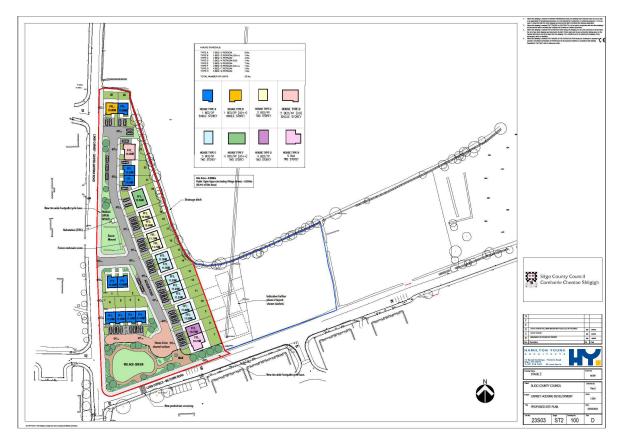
Site Plan for the new housing development at Carney, Co. Sligo
